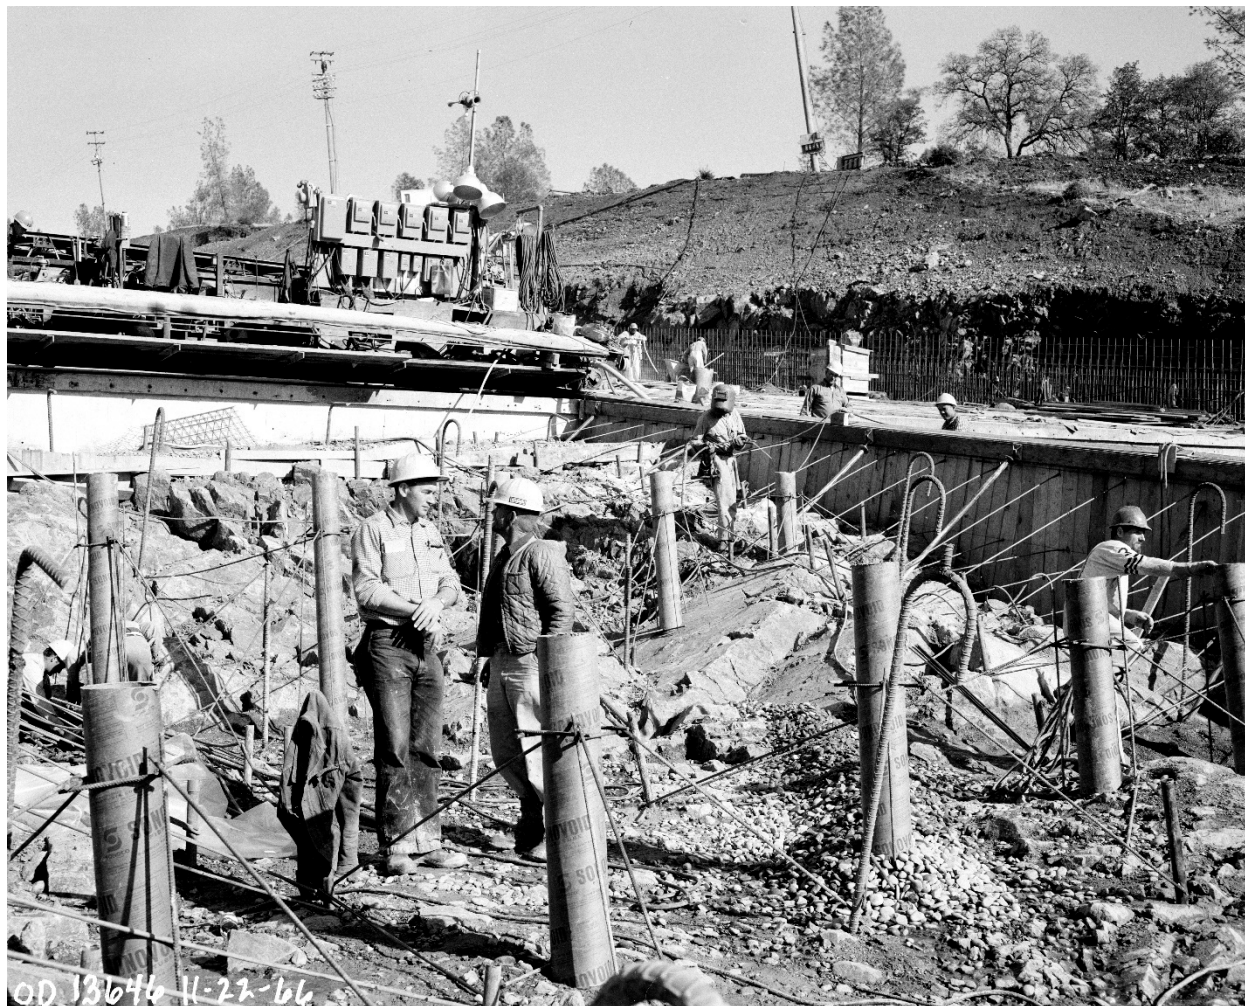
Gravel-filled Sonotubes Being Installed to Connect Herringbone Drains to the Foundation through the Backfill Concrete
